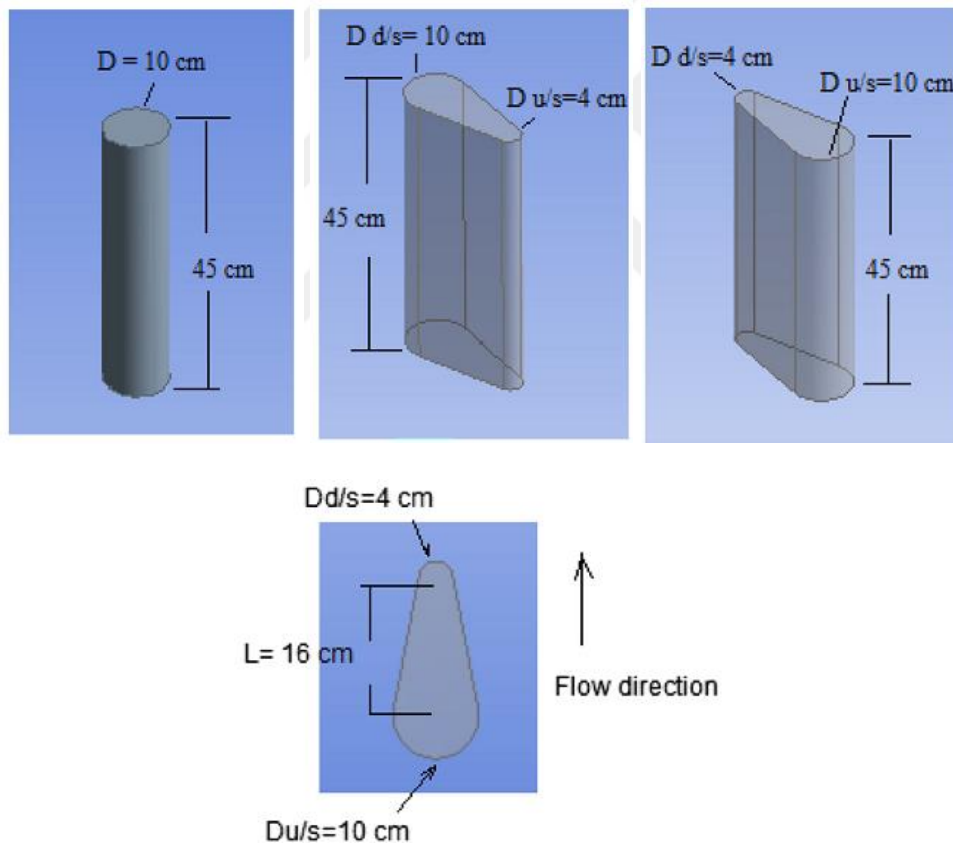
Shape and dimensions of tested bridge piers (Adnan et al., 2015)
